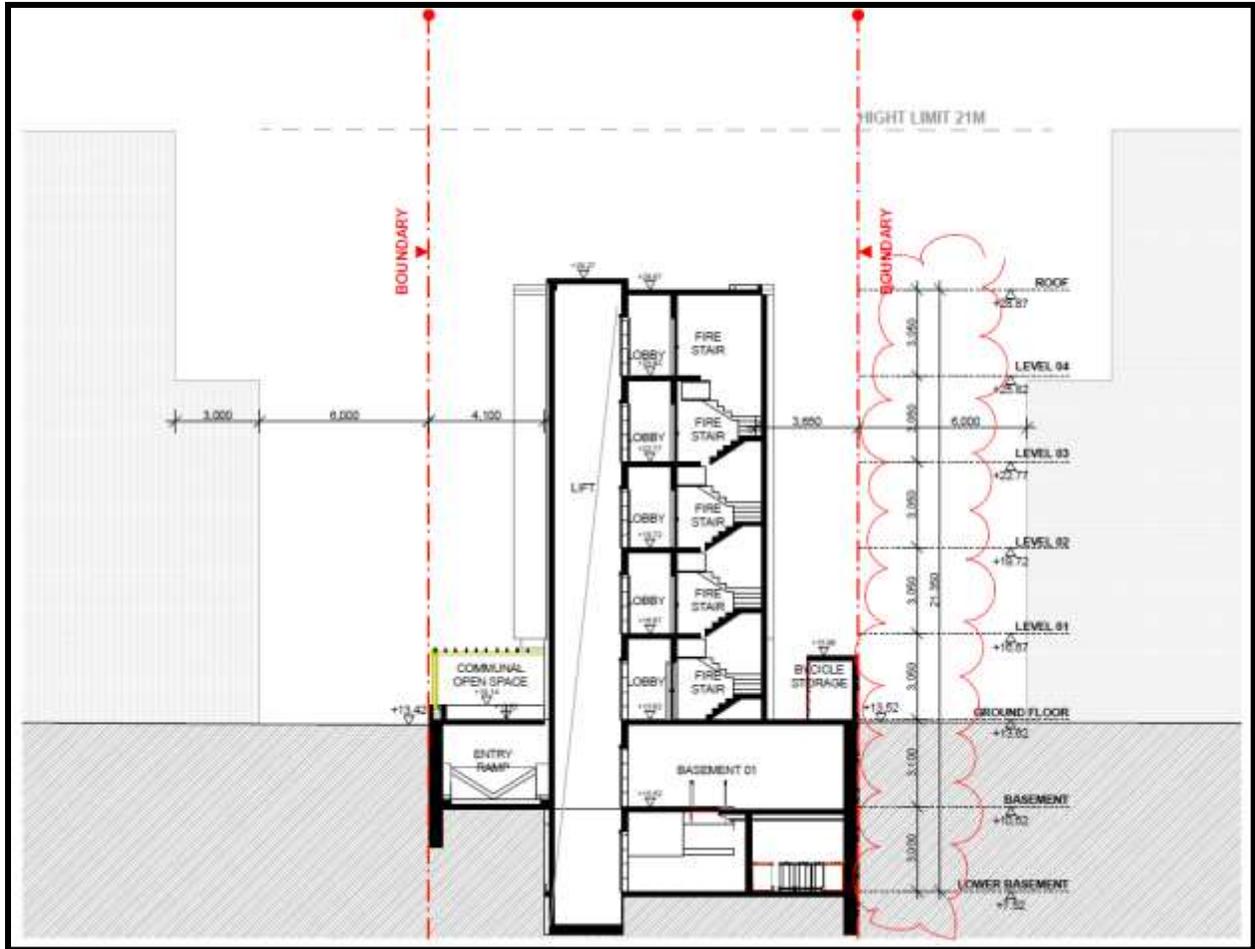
Building Separation to adjoining “future” buildings shown in grey (Source: applicant)
